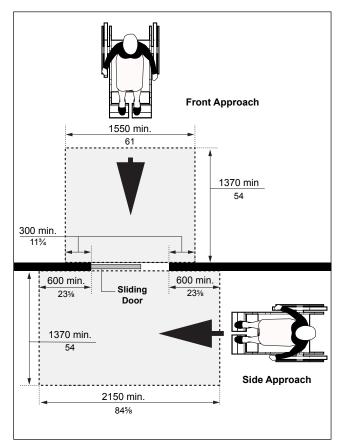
Front and Side Approach at Sliding Door - Plan View
